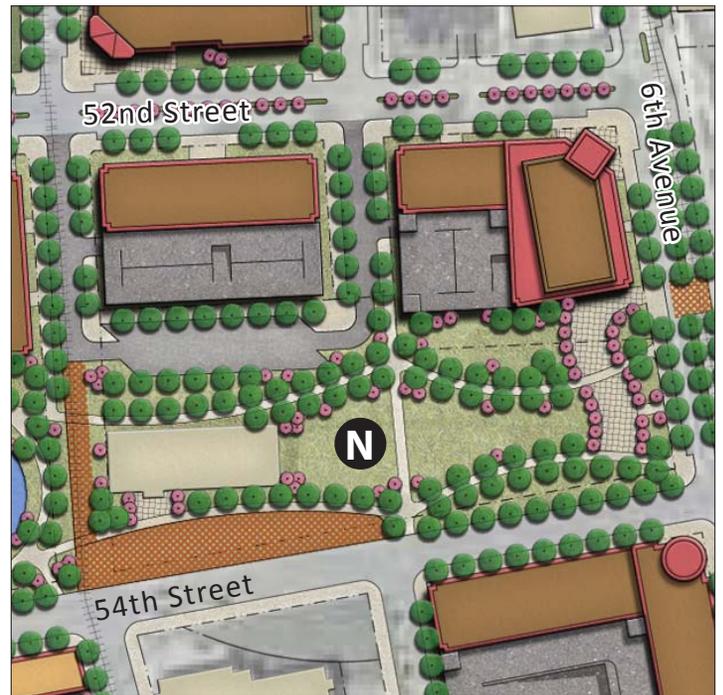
Conceptual Plan Alternative for City Center Open Space
